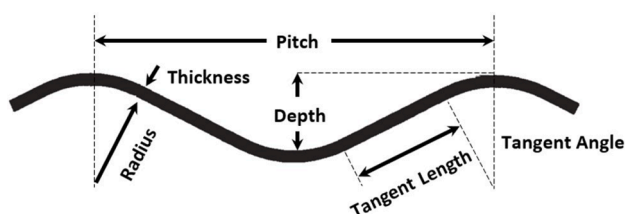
Corrugated Steel Culvert (CSC) profile.
